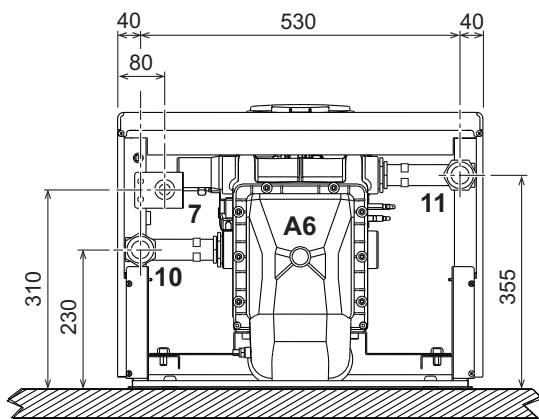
Bottom view - model FORCE W 60 and FORCE W 80
